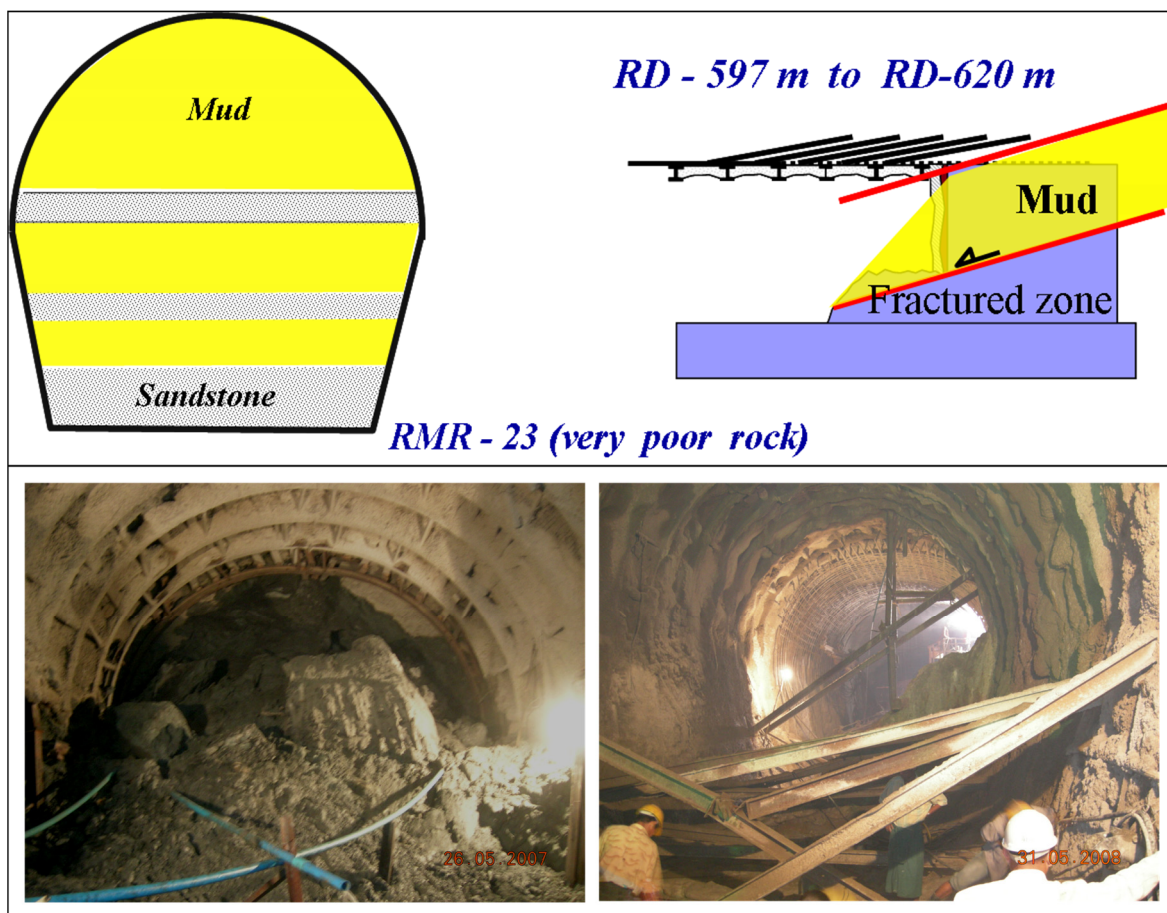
Tunnel Face Failure at Weak and Loosened Zone
